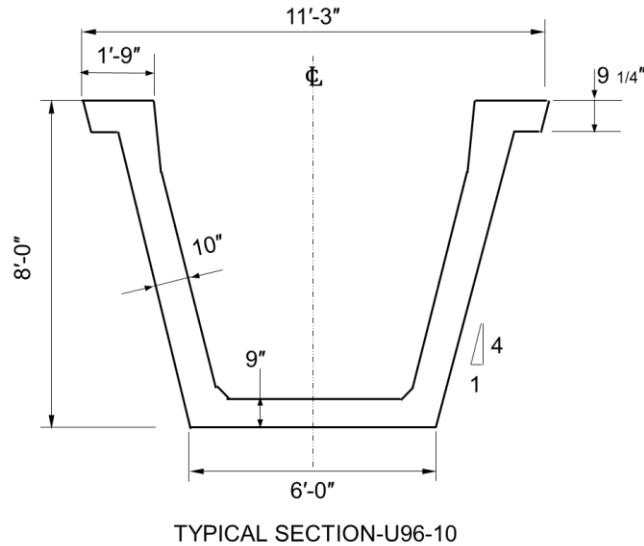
TxDOT Standard U-Beam Section U96-10
